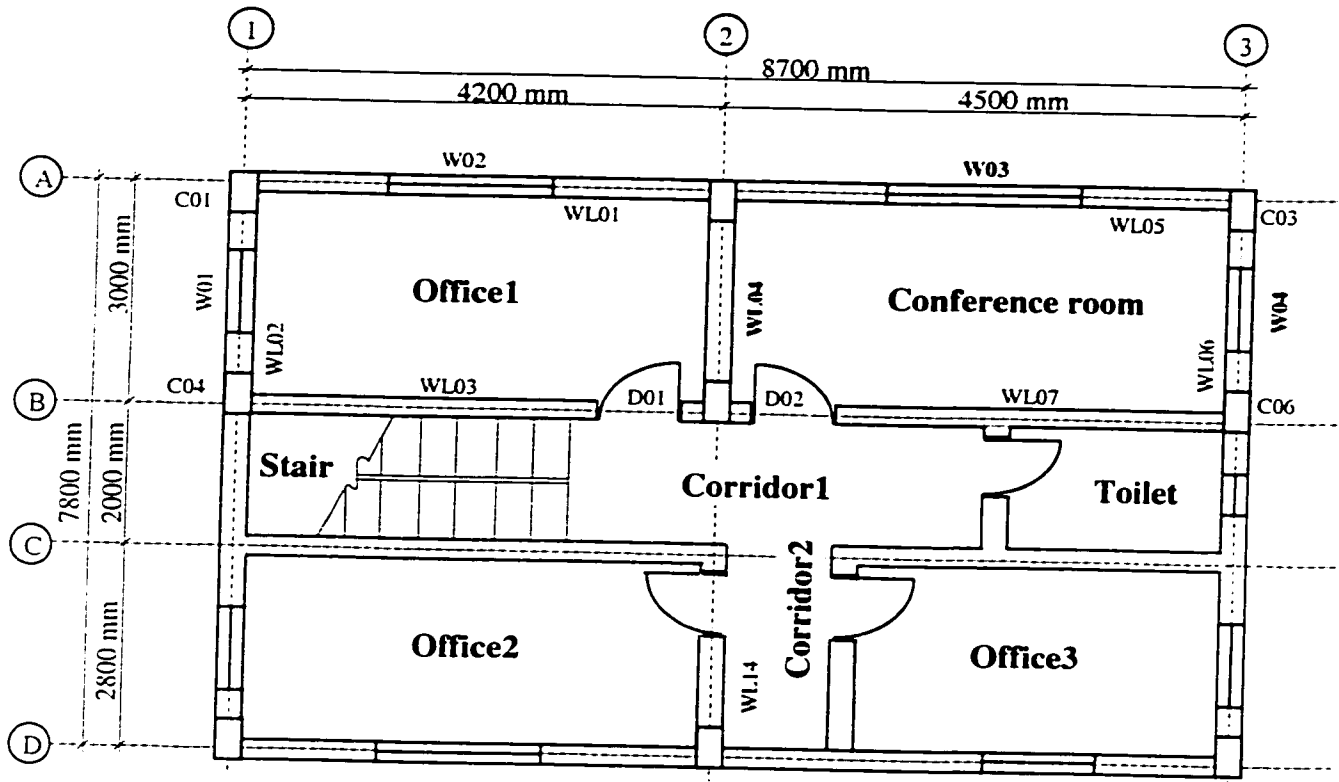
Architectural First Floor Plan for the Concrete Building Example.
